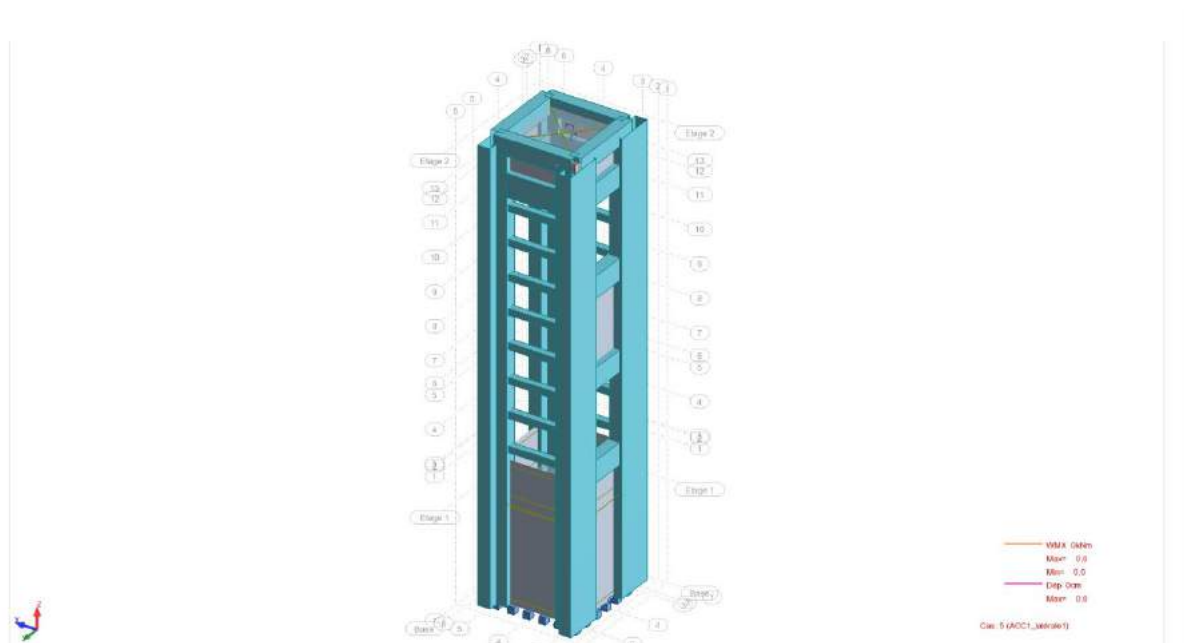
Footbridges – Model for the reinforced concrete shafts
